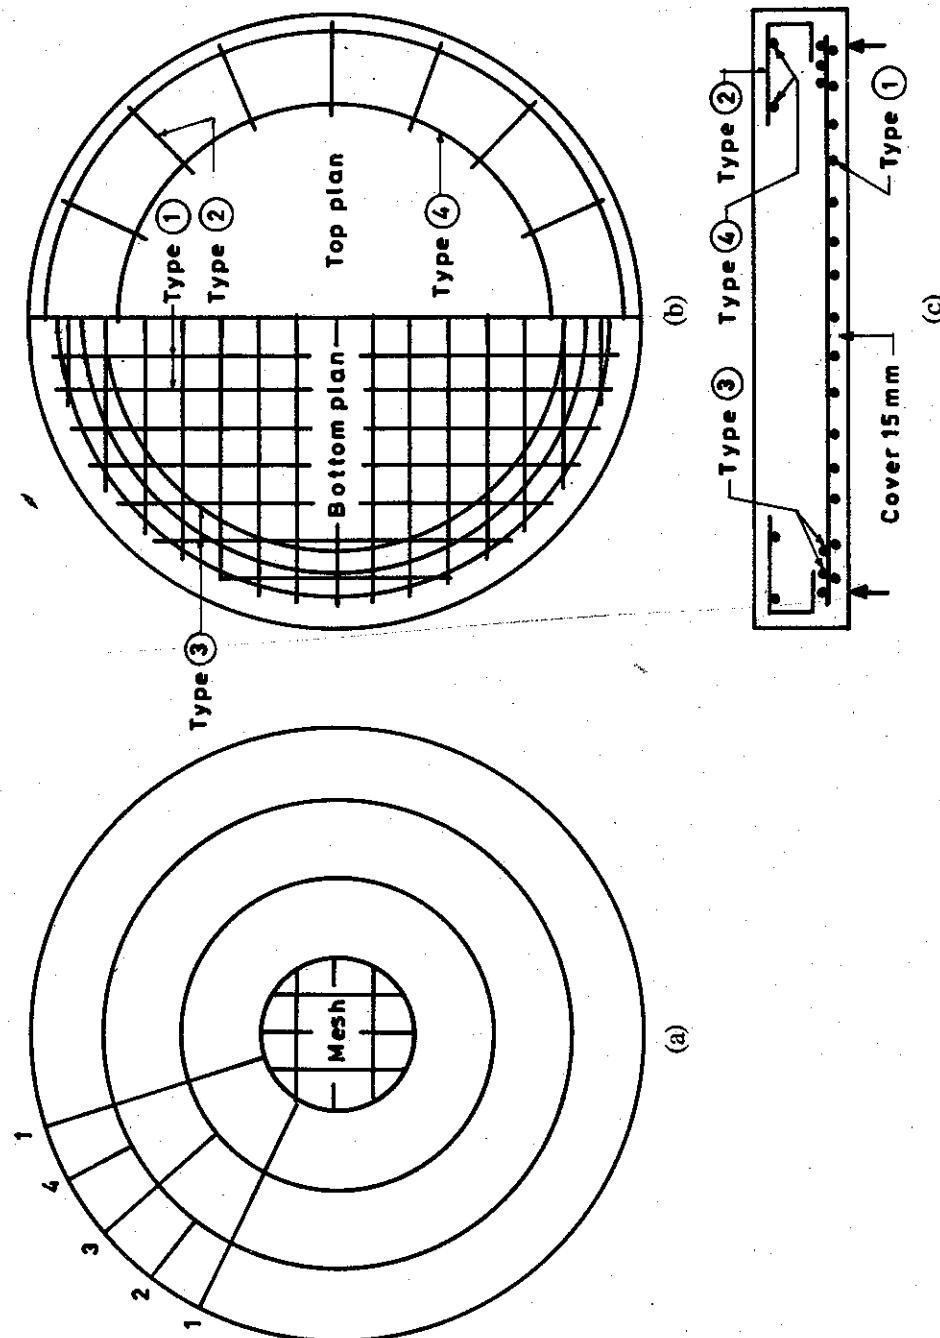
Arrangement of steel in circular slabs: (a) Radial arrangement, (b) Grid arrangement (b)—in section, (c) Grid arrangement (b)—in section.
